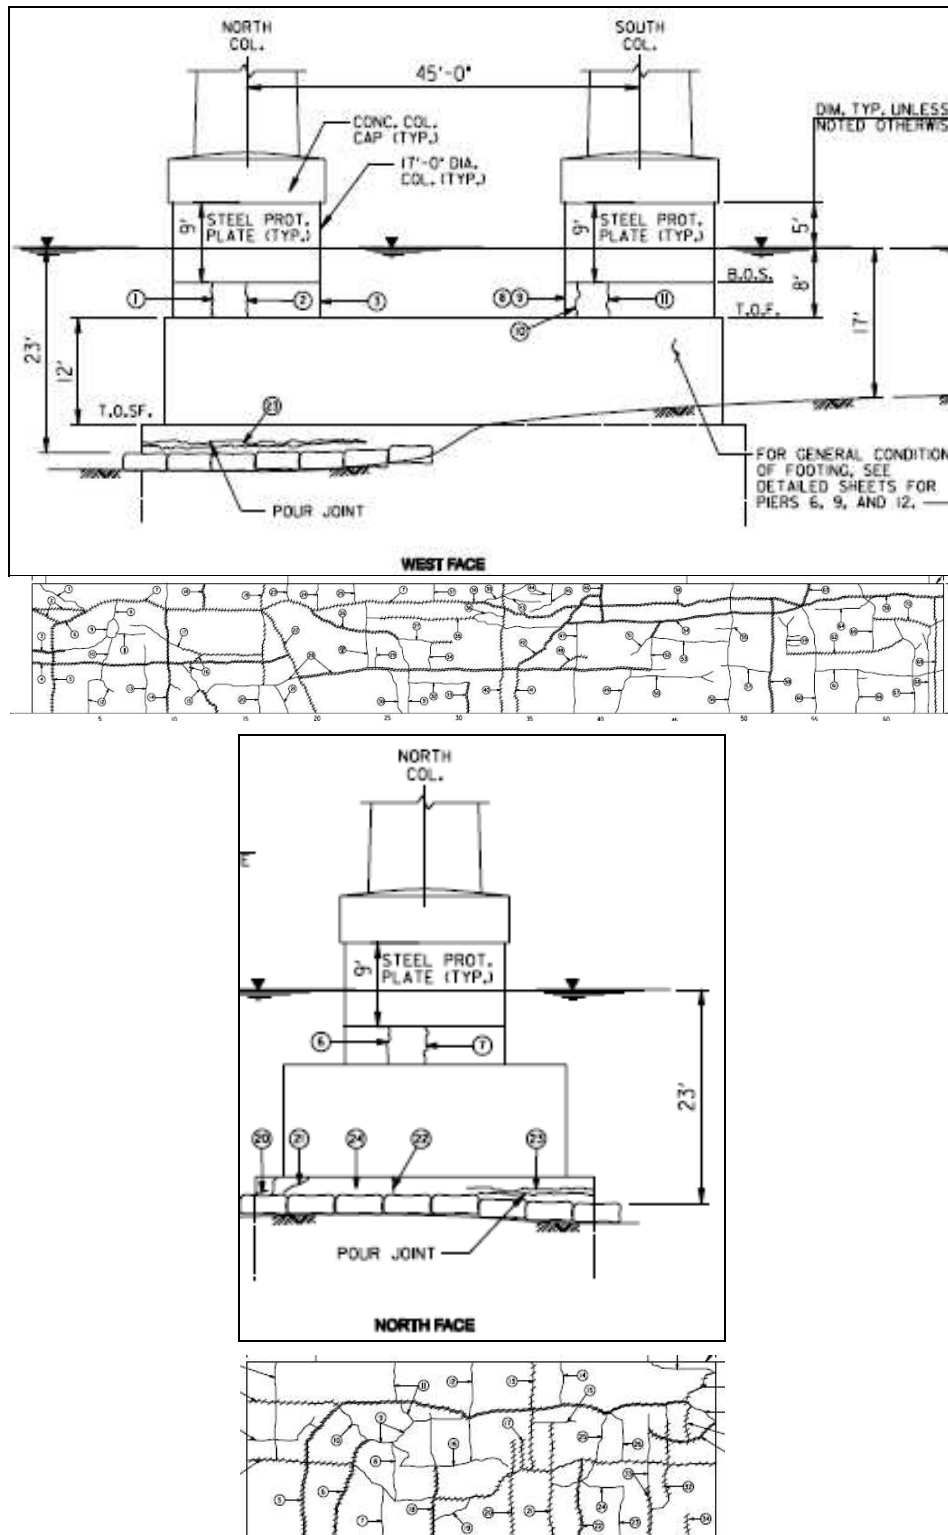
North and West faces of pier 7 with details of crack pattern
